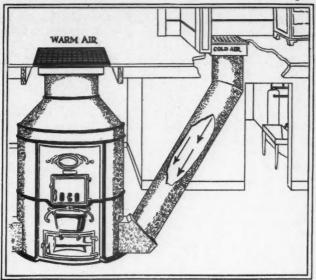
How Heating with a Pipeless Furnace Can Be Improved by Extending the Cold Air Duct to the Bottom of the Casing.
